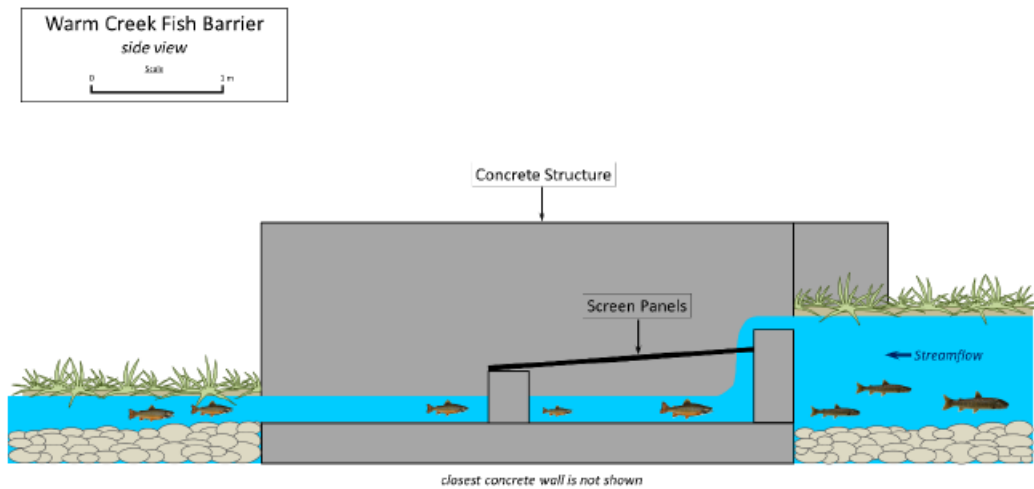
Warm Creek barrier design – side view. The barrier could undergo some modifications in design during construction.
